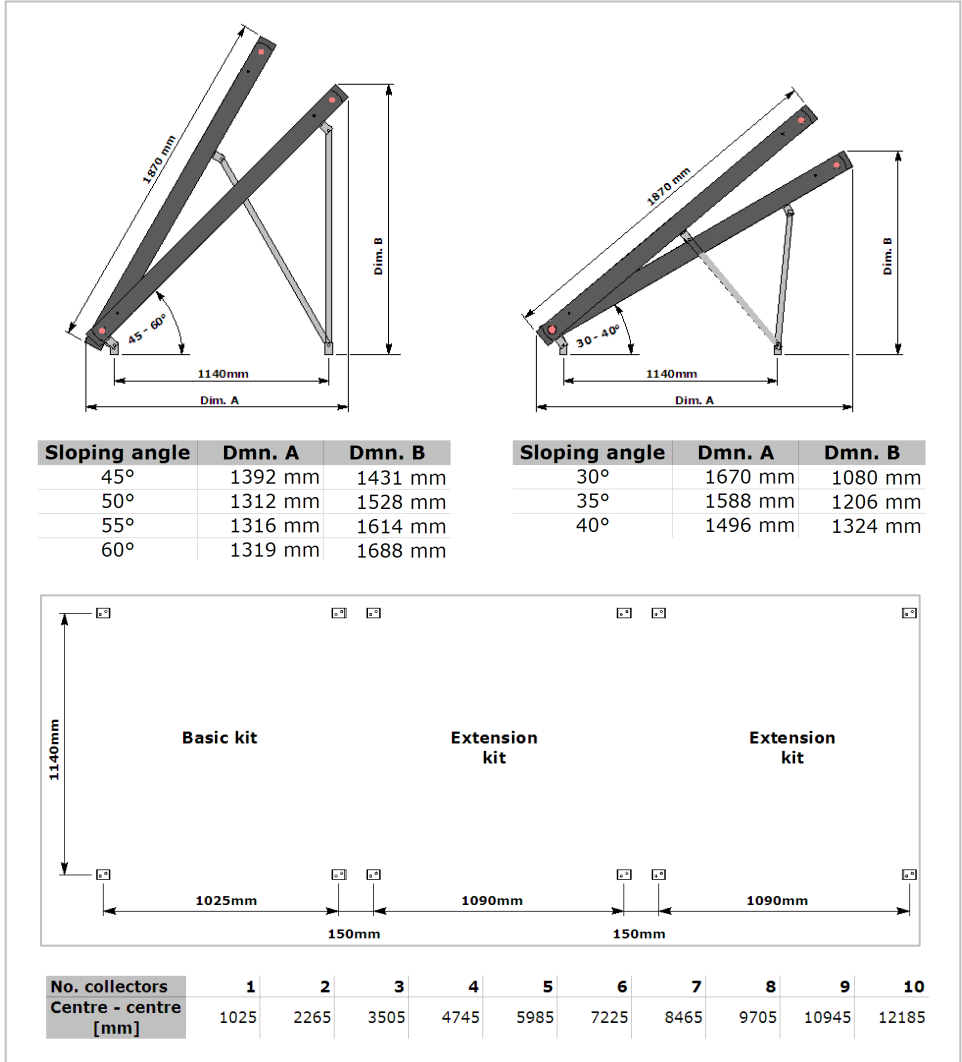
Space requirement Dimplex SOLC220 free standing installation
